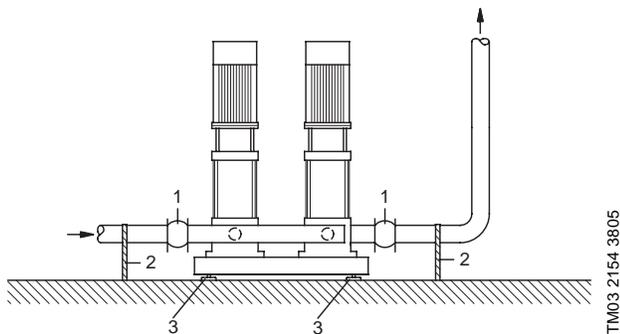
Sketch showing the position of expansion joints, pipe supports and machine shoes
